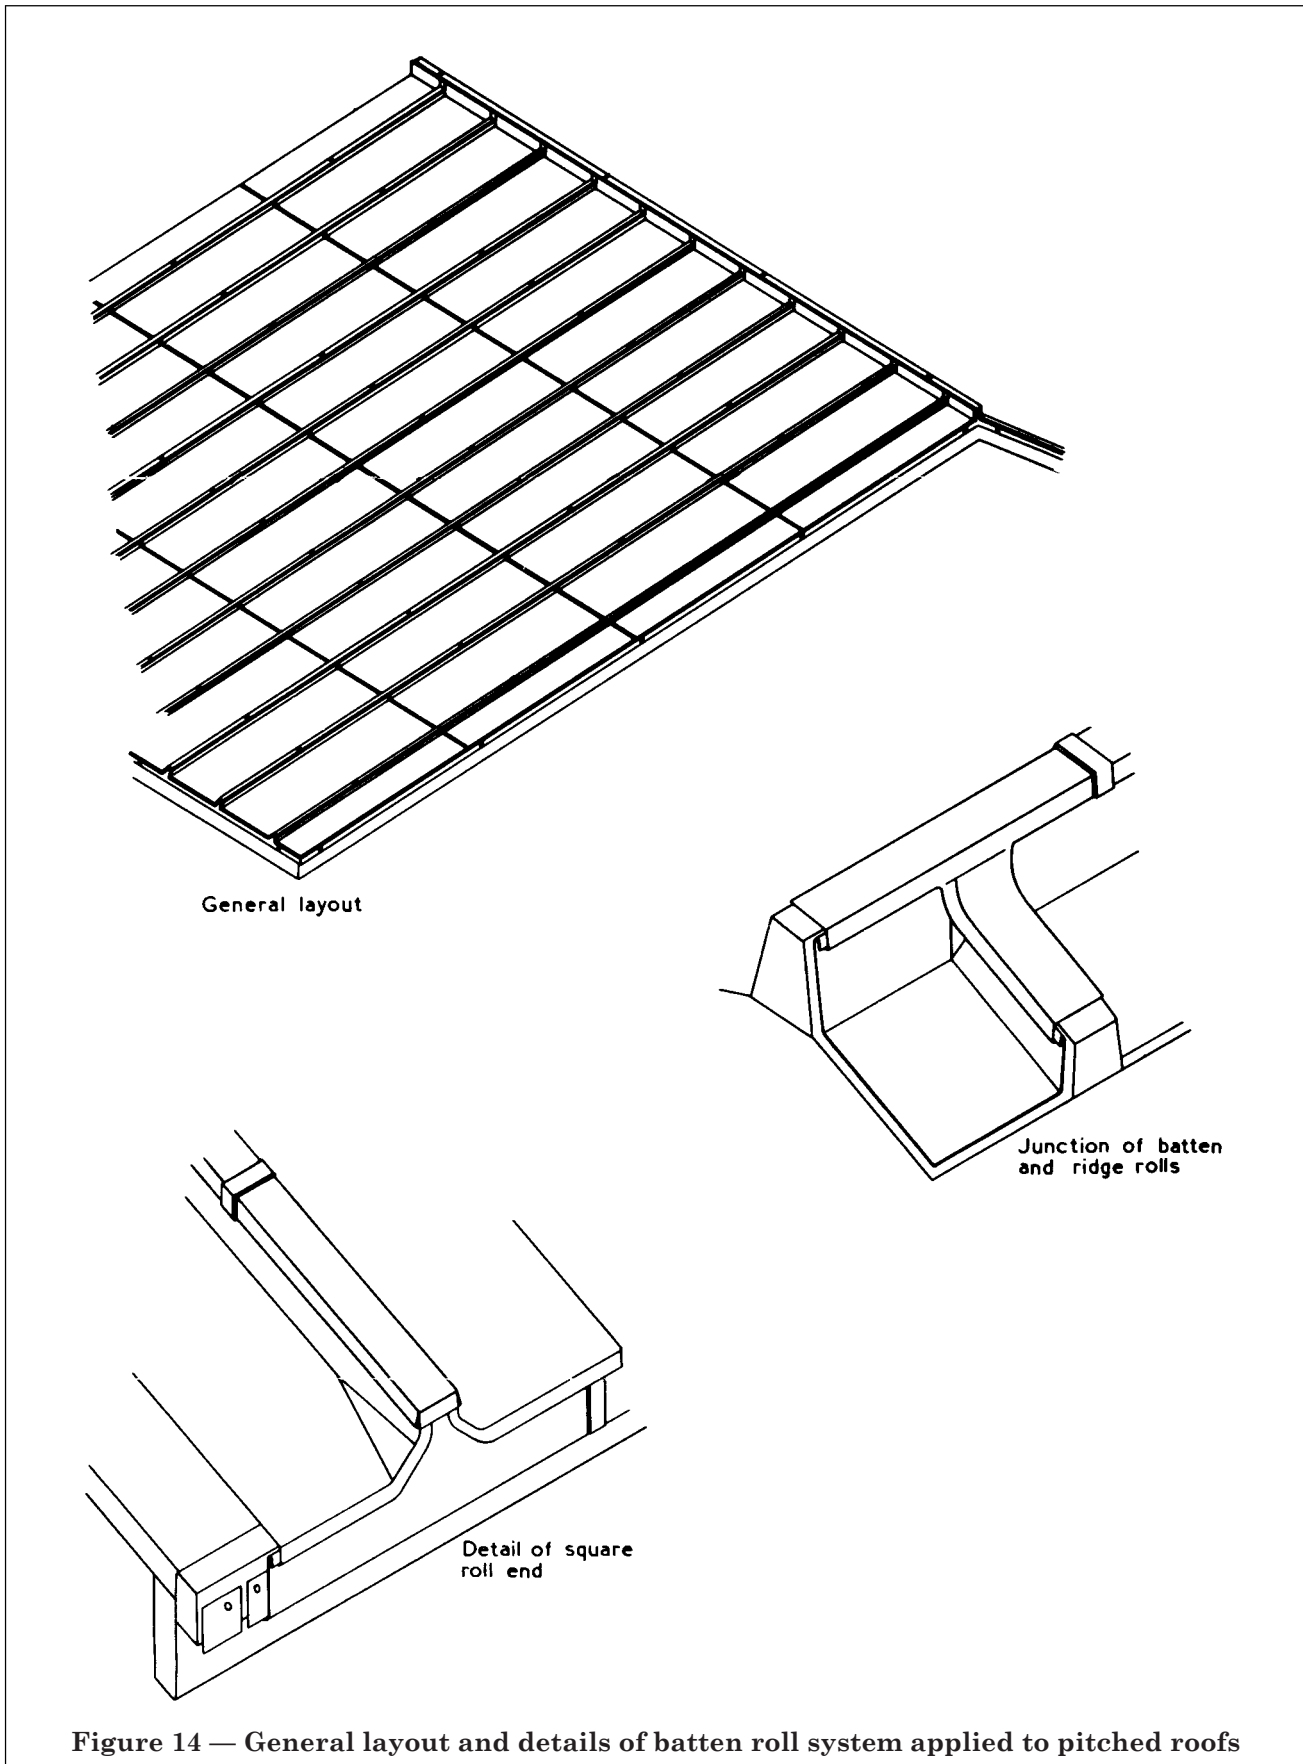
General layout and details of batten roll system applied to pitched roofs
